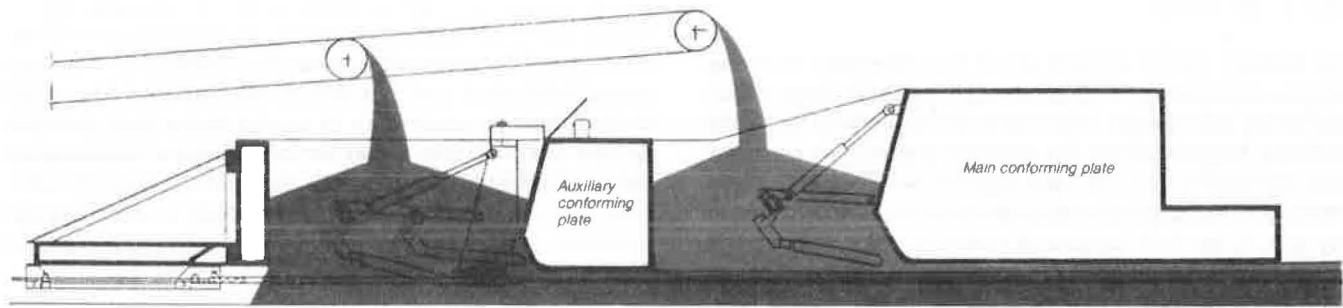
Longitudinal cross section of the modified slipform paver.
